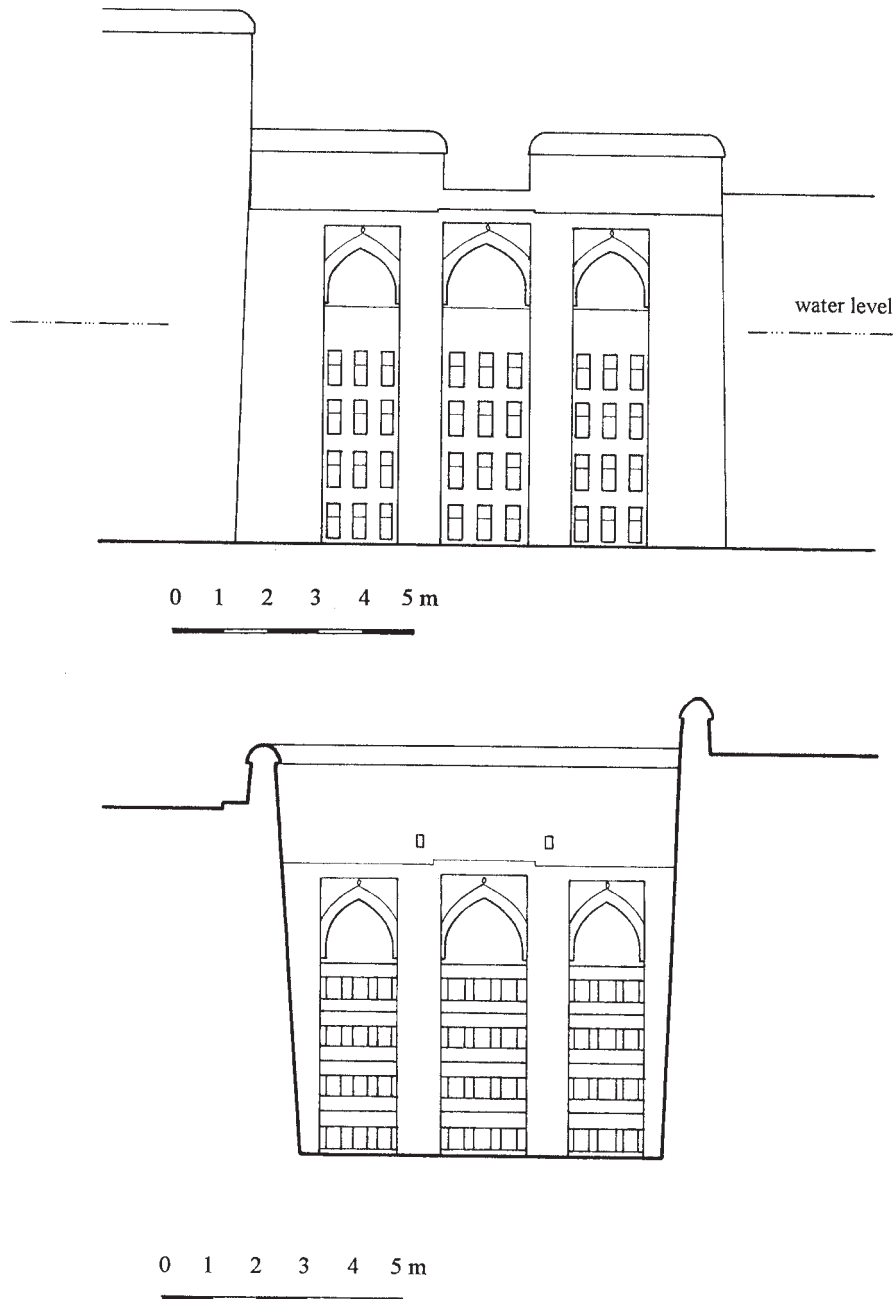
Sluice gate, above: western elevation, lake side and below: eastern elevation, dam side, also showing the section of the canal encasing the arches.
